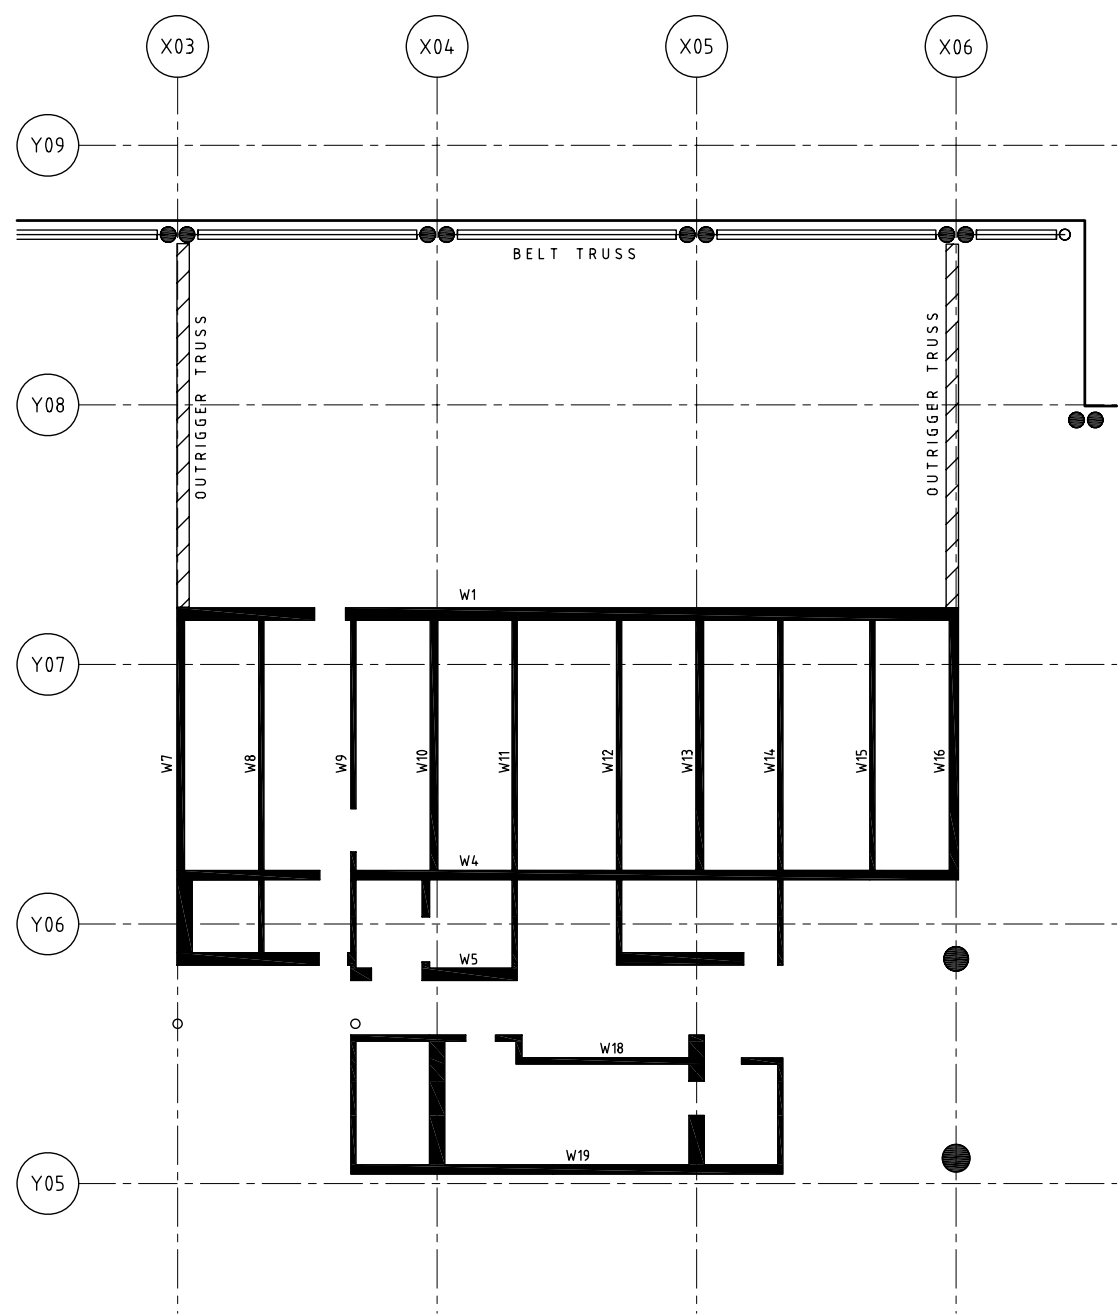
Level 34 outrigger truss locations (Source: Hyder Consulting)
